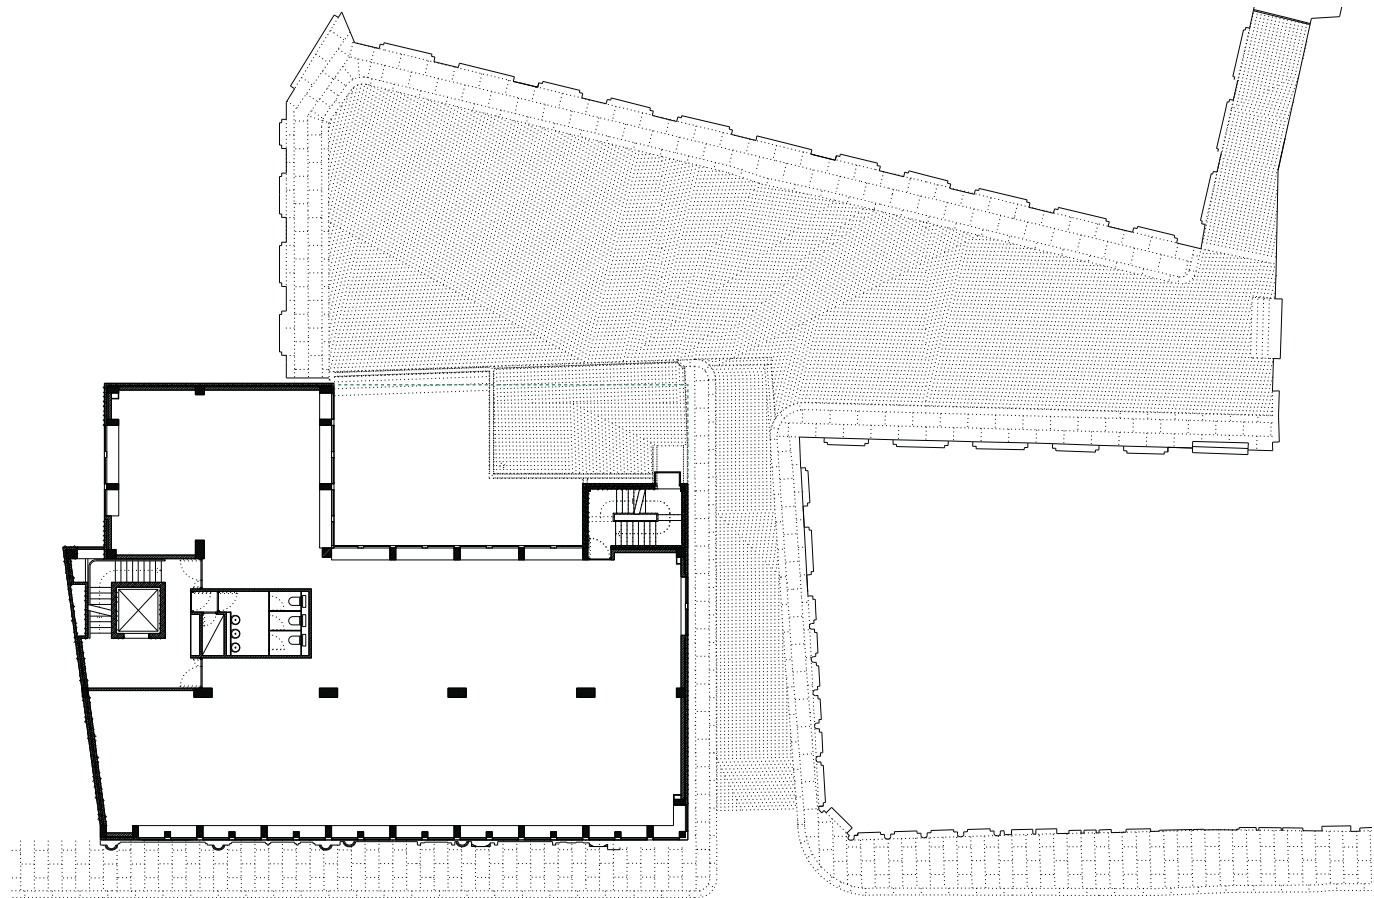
Existing site plan with proposed infill to occupy the previous building’s site area, offering more floor space.
